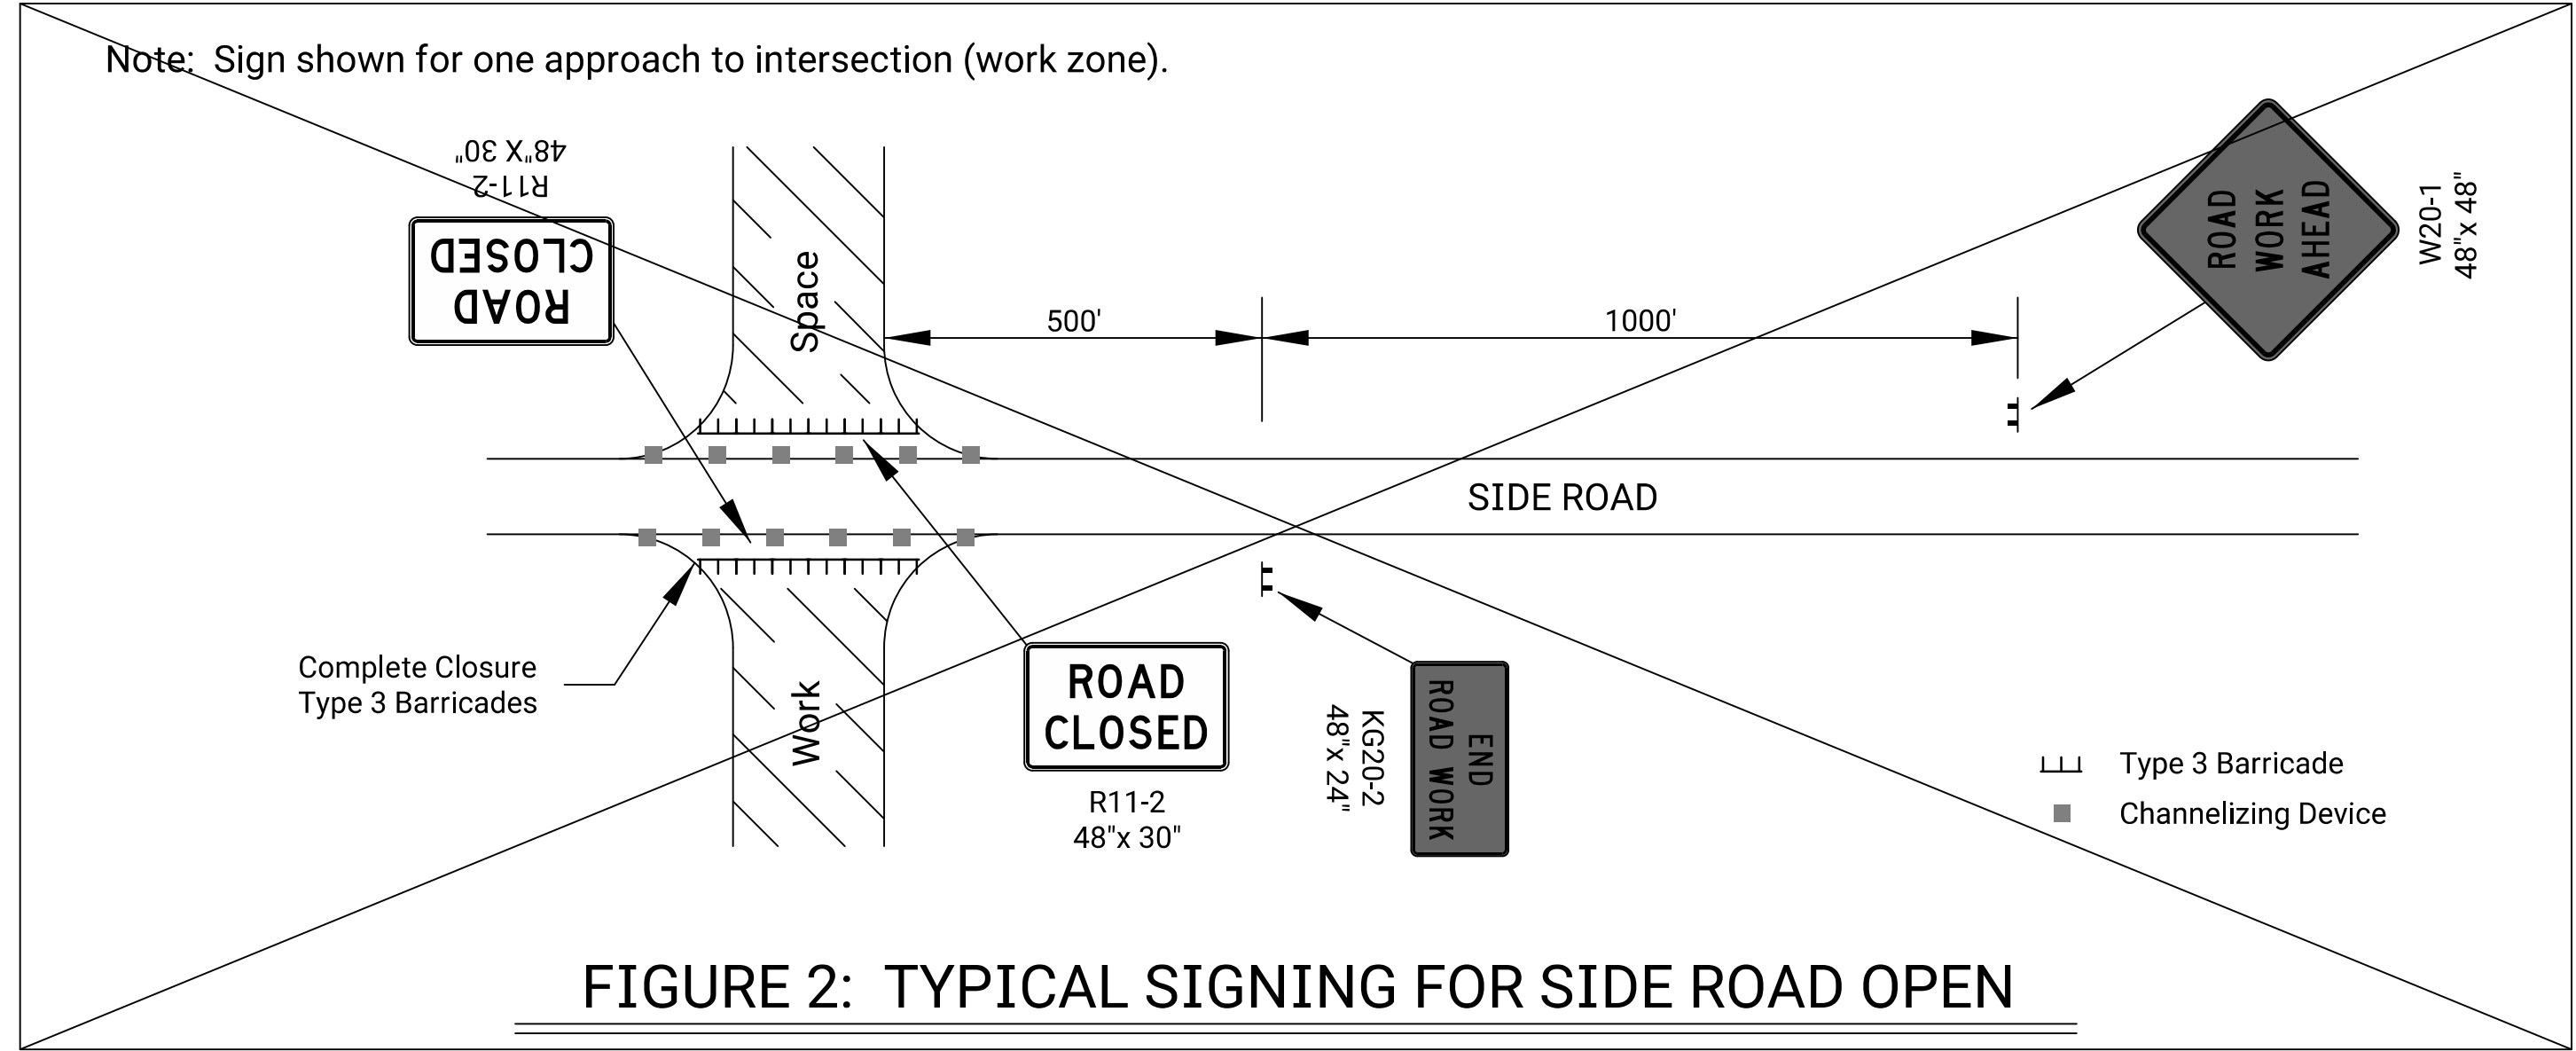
TYPICAL SIGNING FOR SIDE ROAD OPEN
